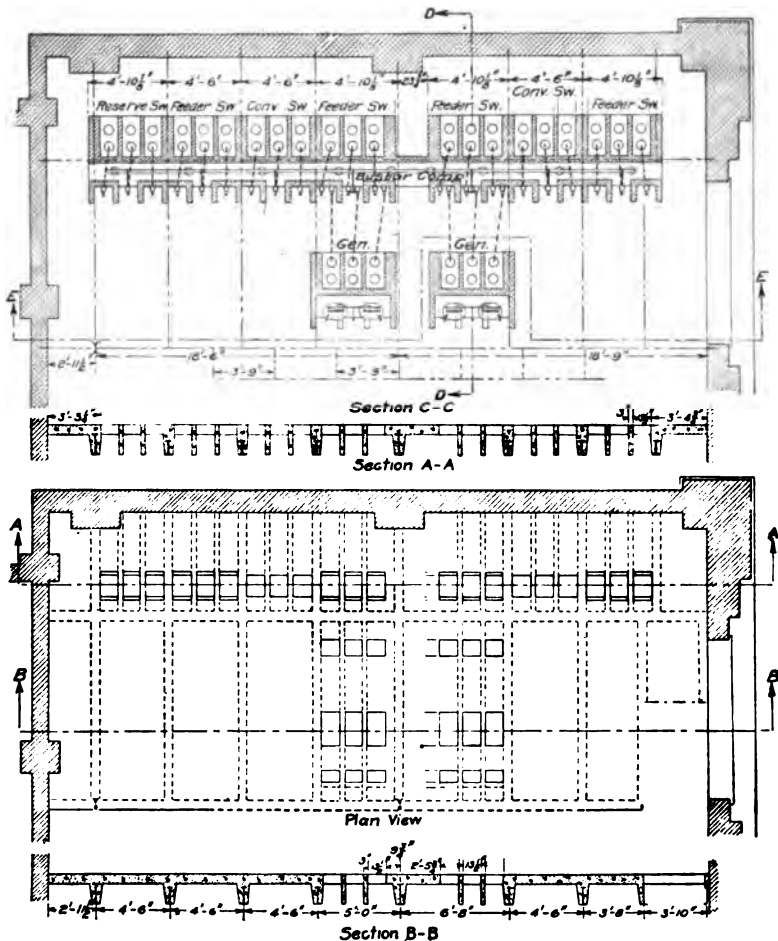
Plan and Construction of Switchboard Gallery, Coney Island and Brooklyn R. R. Co.
